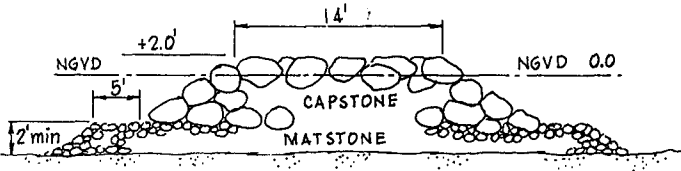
Typical Breakwater/Spur Structure Cross-Section
